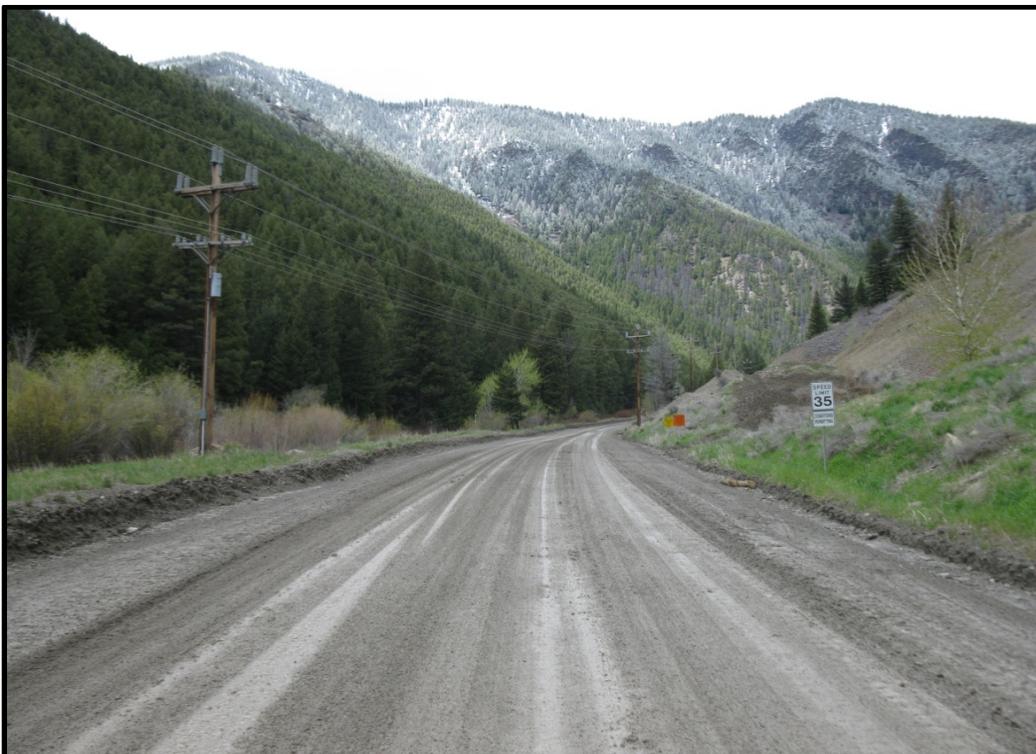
Selected land surrounding Bruno Creek access road, view to west.
